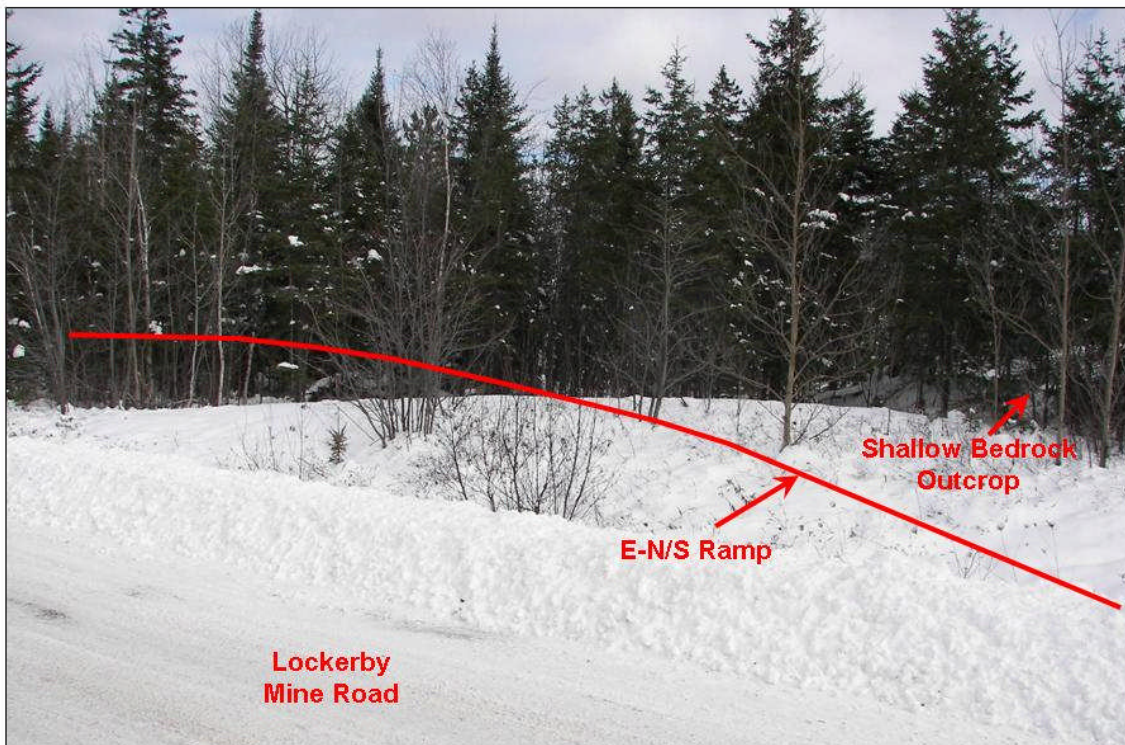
VIEW: Looking east from north shoulder of the Lockerby Mine Road about 900 m east of intersection with existing SMR3. Existing Lockerby Mine Road starts to swing to north to intersect realigned SMR3. Shallow bedrock in bush areas. (Dec. 6, 2007)
